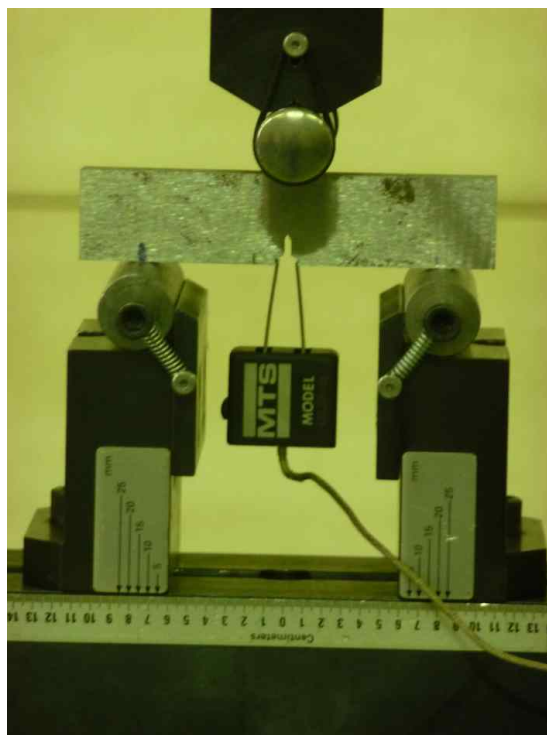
Specimen mounted on a servo-hydraulic test machine during the tests at Politecnico di Milano.
